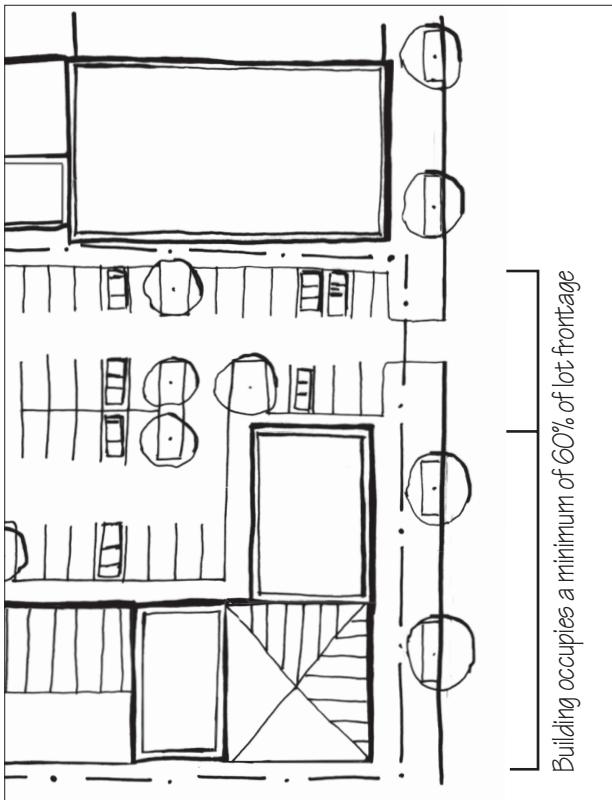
Buildings should be placed on the maximum amount of lot frontage frontage to best frame the street and sidewalk.
